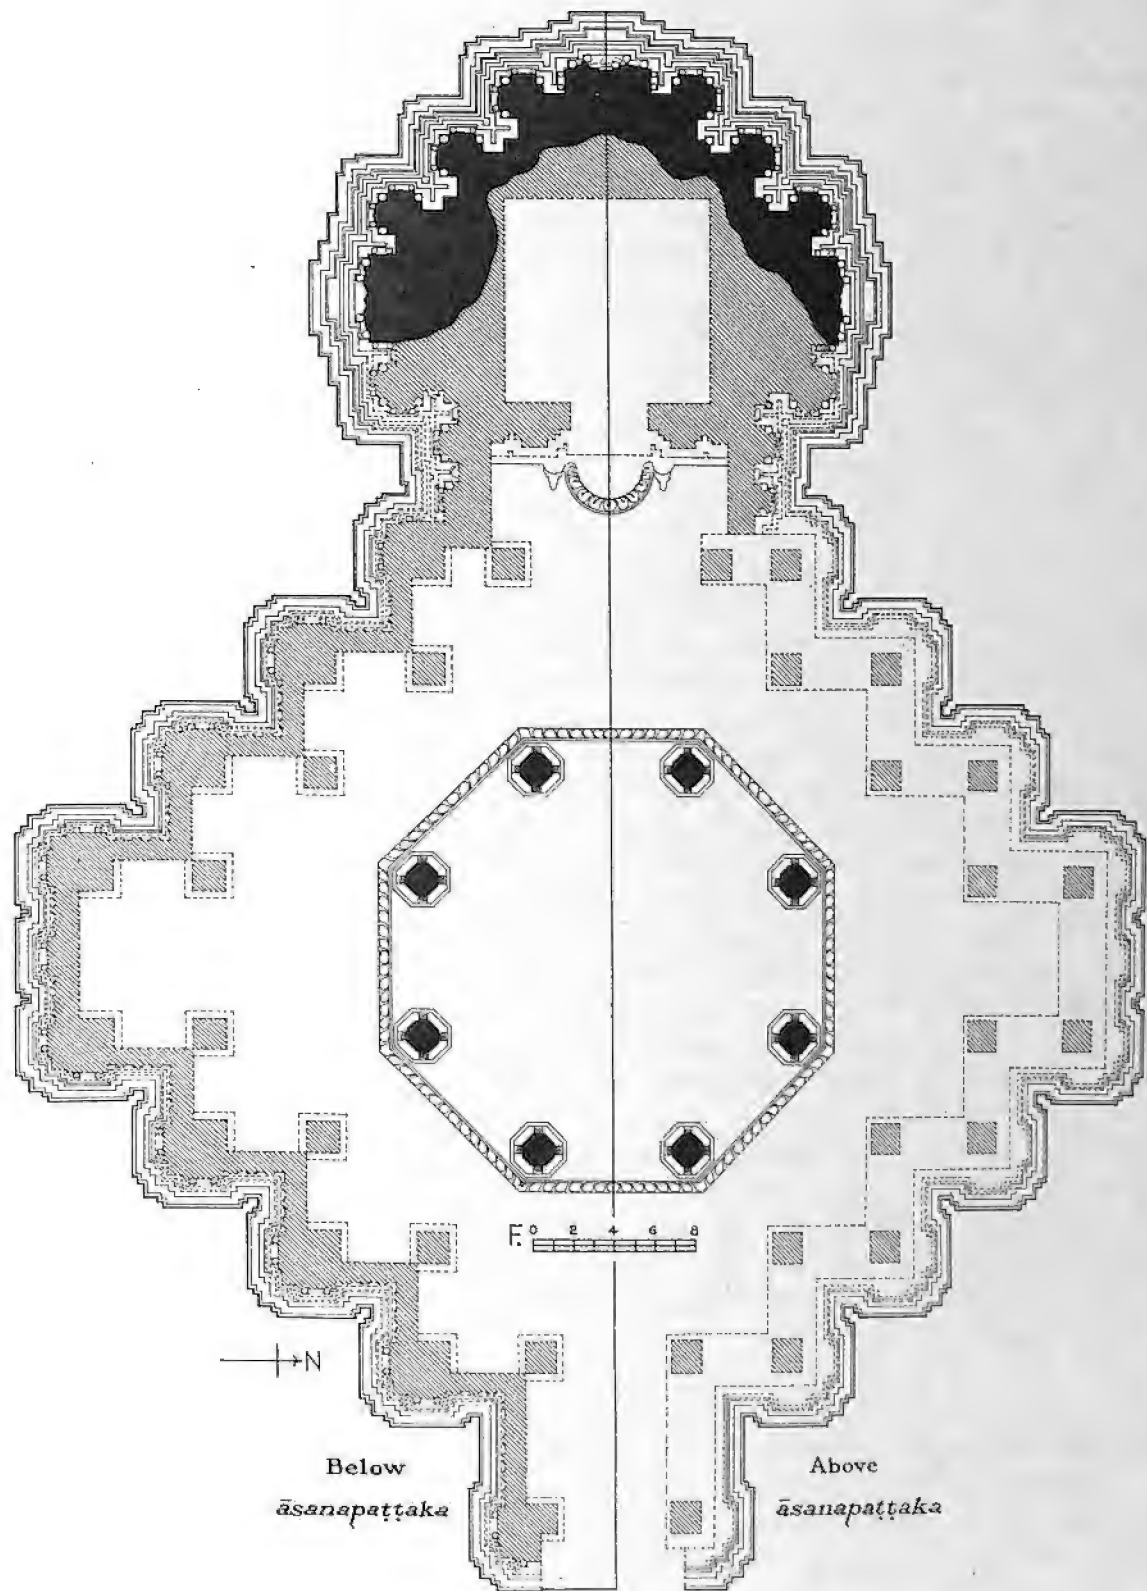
Kirāḍu. Viṣṇu temple, plan.
